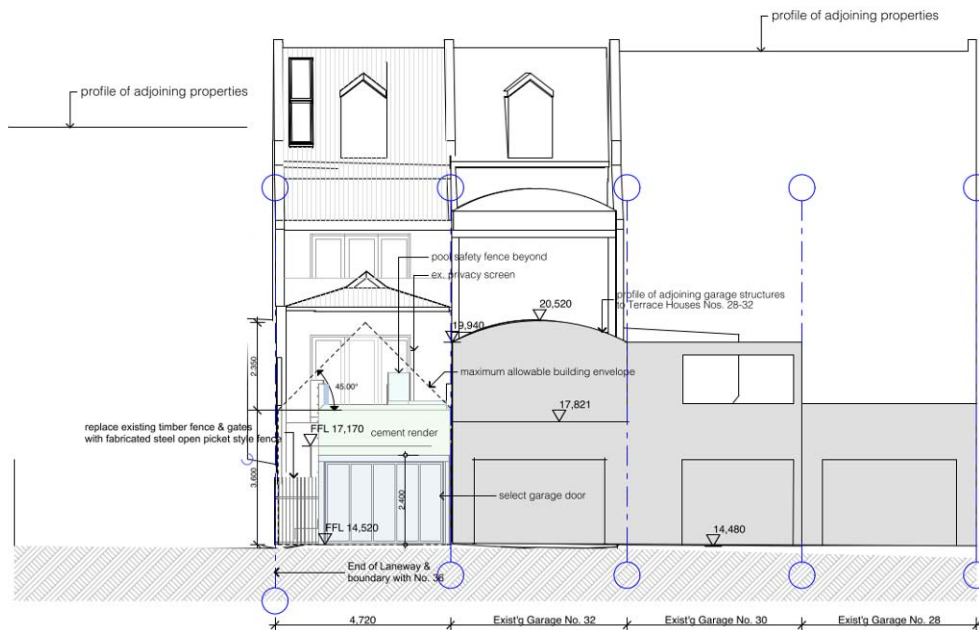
Proposed rear elevation at 34 Rosser Lane Rozelle.
